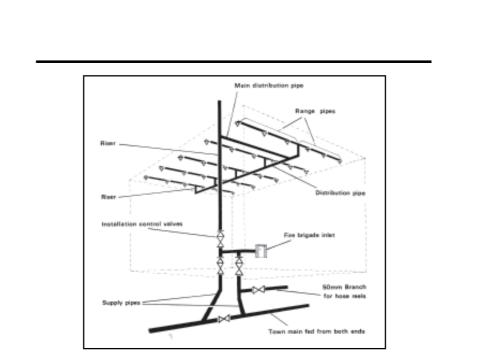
Diagramatic lay out of pipework of a sprinkler installation.
